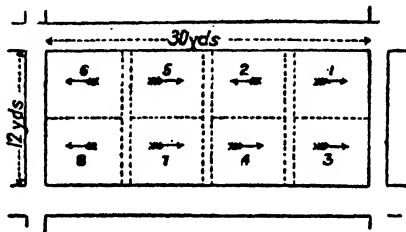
METHOD OF WORKING PILLARS AT TOWNELEY.
